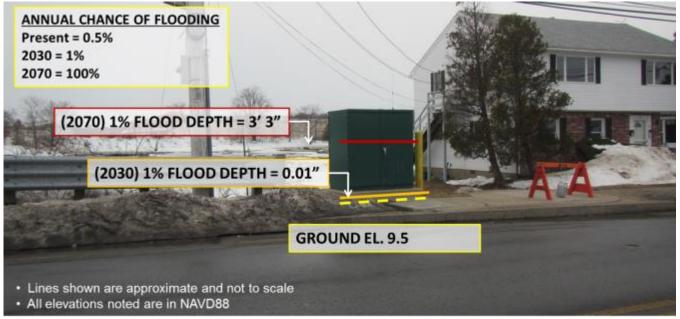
Thatcher Road Pump Station Elevation and Flood Risk
